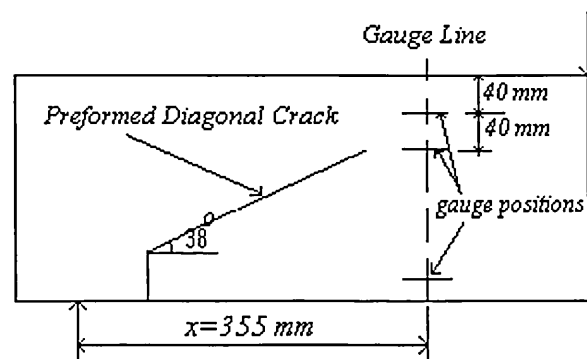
Details of Preformed Crack and Location of Dial Gauges
